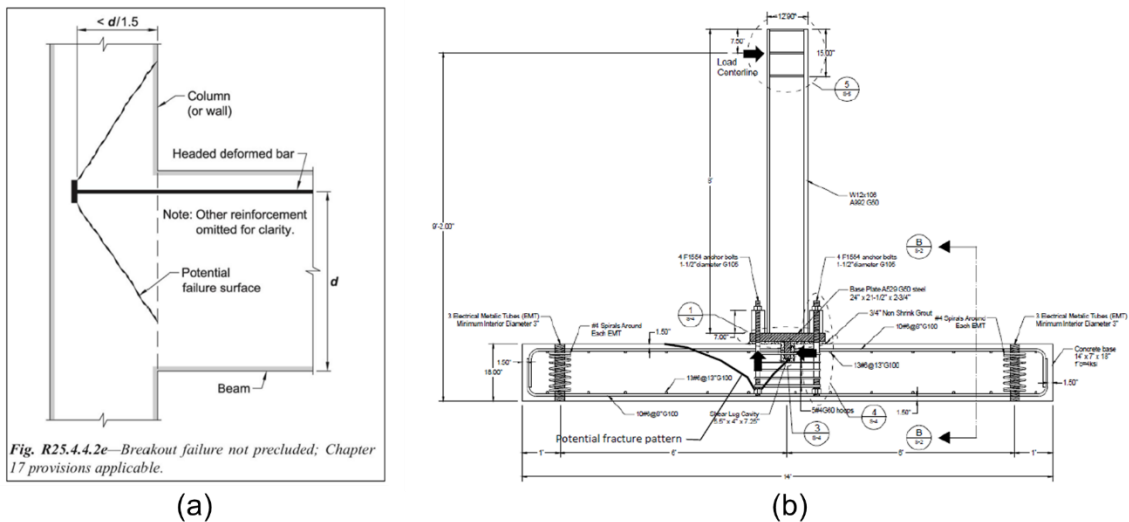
(a) Commentary to ACI 318-14 and (b) column-to-foundation test specimen
